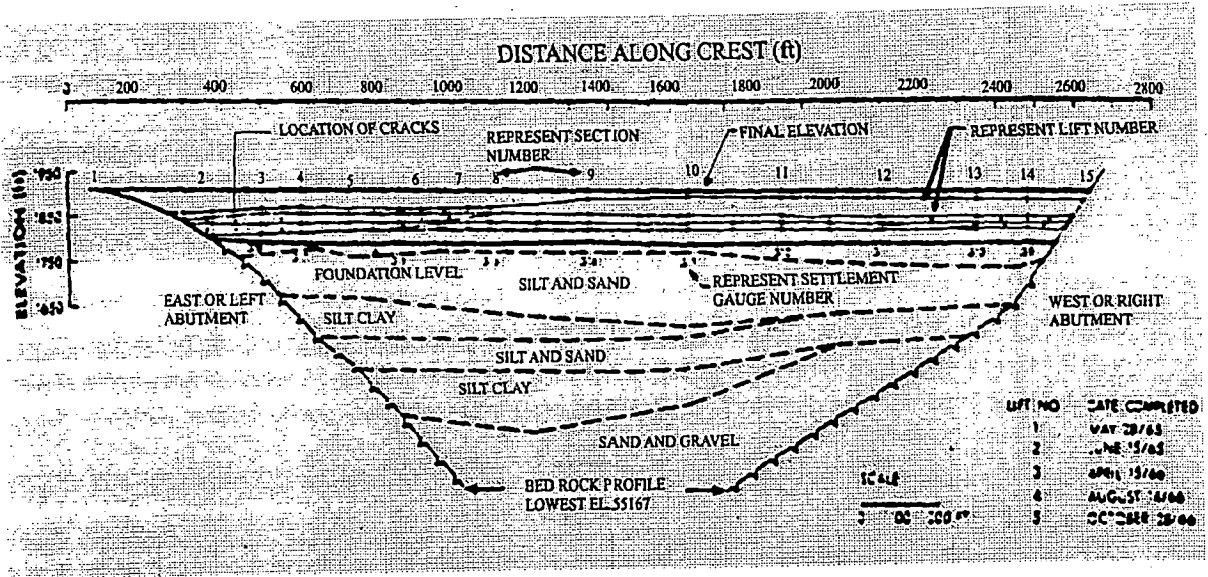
(b) Longitudinal Section of Duncan dam and Foundation showing Construction Sequence and Location of Cracks
